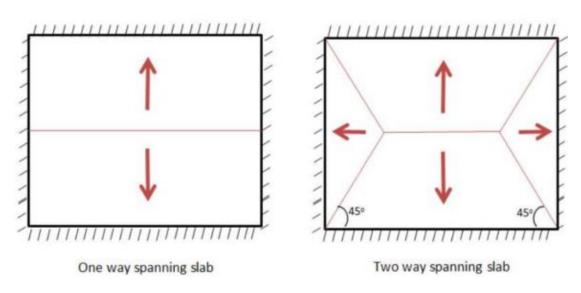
2: Distribution of load on One way & Two way slab (Basic Civil Engineering).
